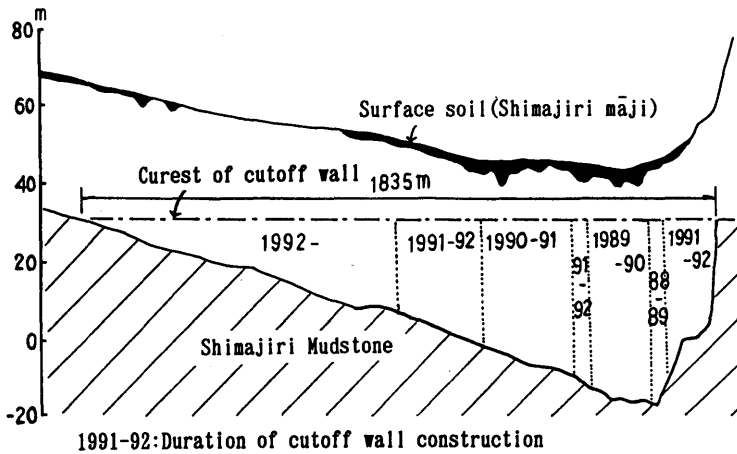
Cutoff wall construction of Sunagawa Subsurface Dam.
